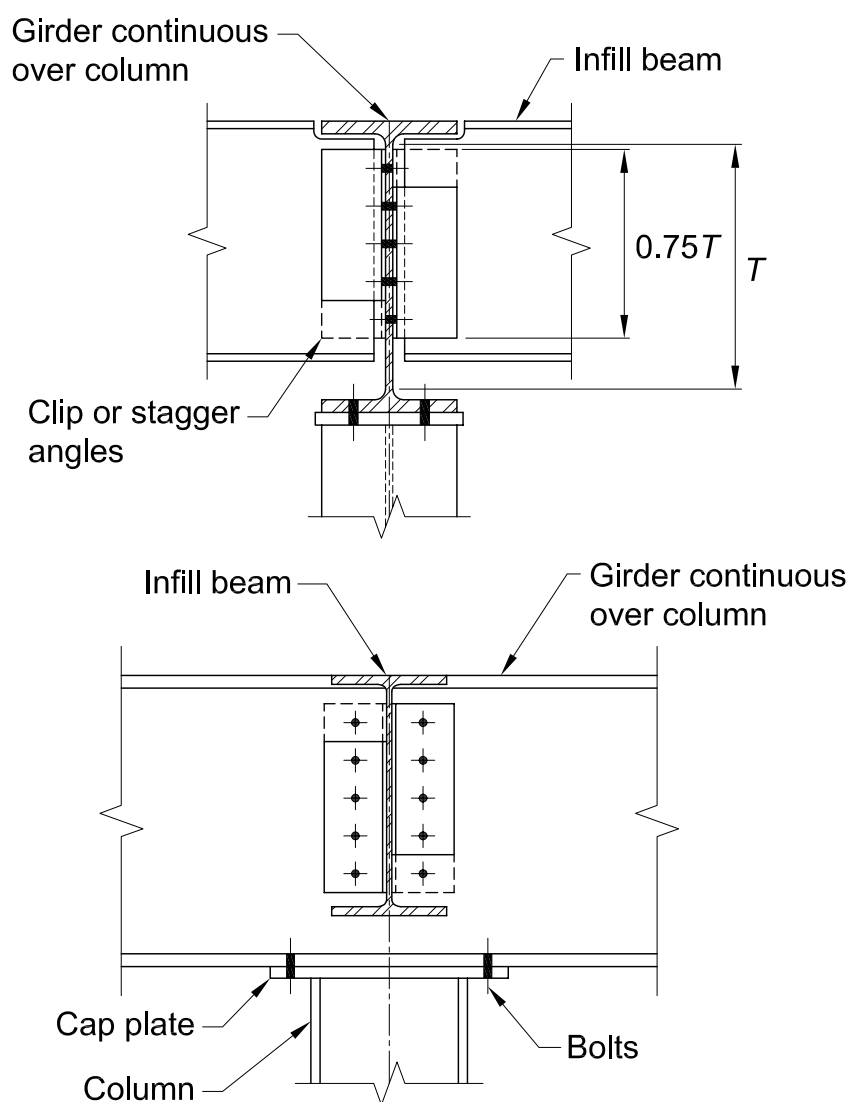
Beam framing continuously over column top, stability provided with connections of infill beams.
